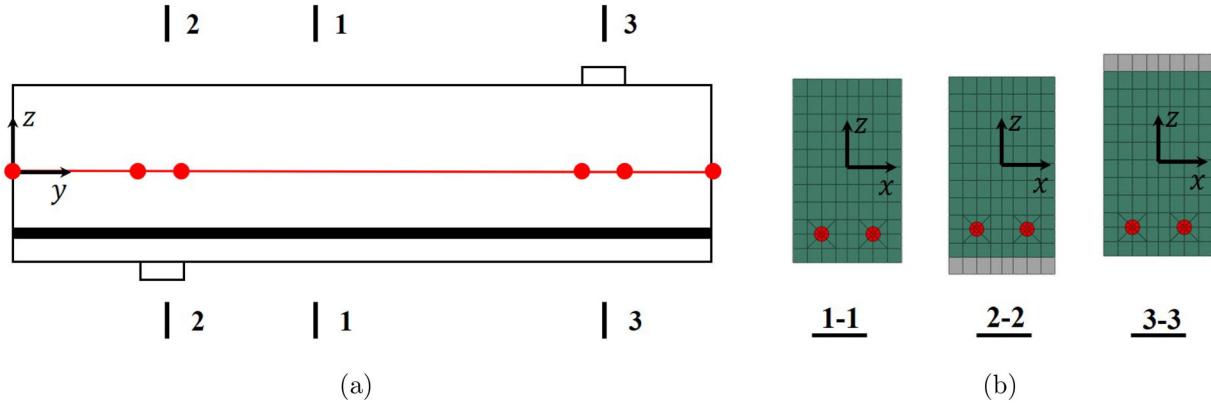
Mesh assignment of Leonhardt beam: (a) Beam element; (b) LE cross-section discretization.
